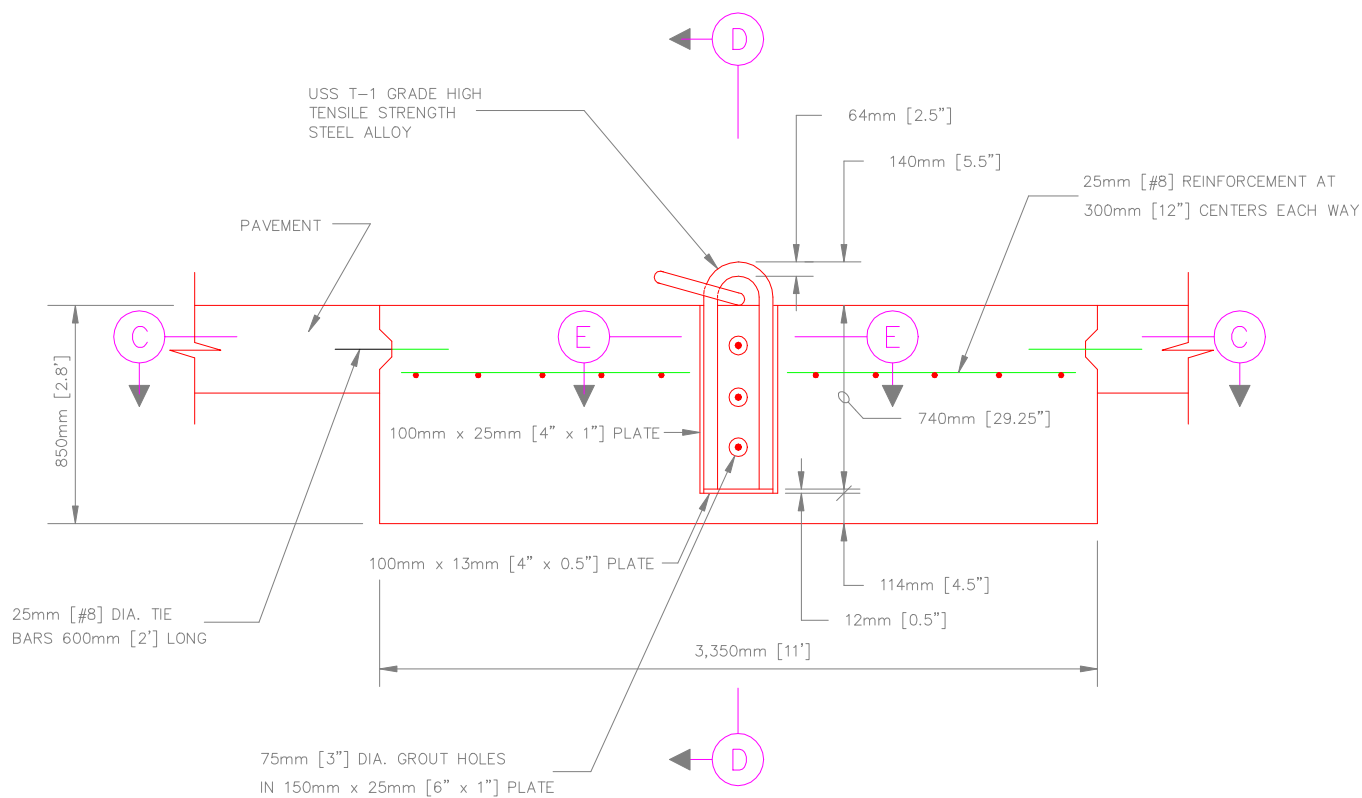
Example of Square Anchor Block, Cross Section A-A and B-B.
